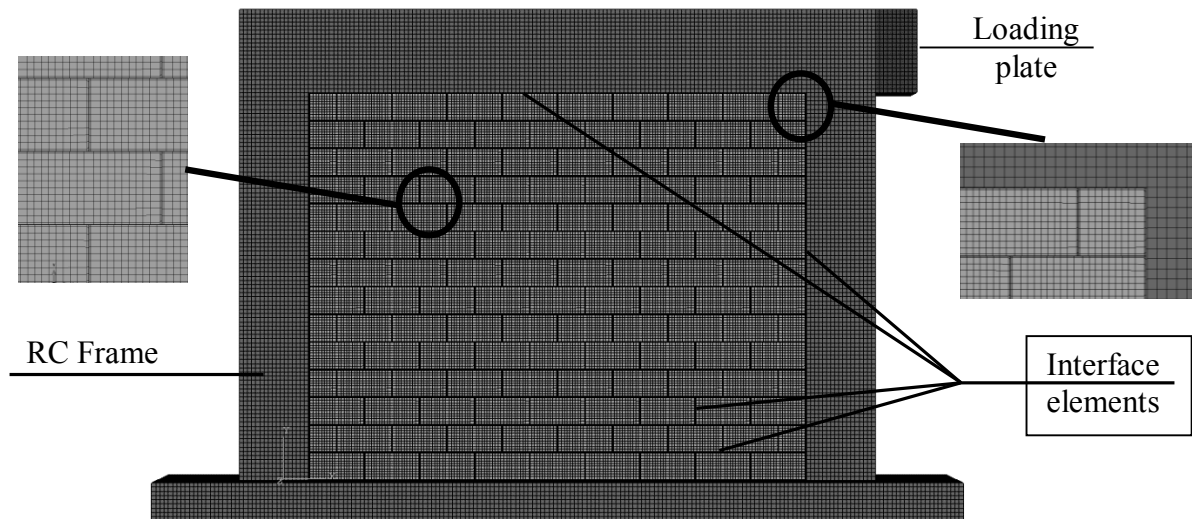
Schematic for a typical FEM for a masonry infilled RC frame
